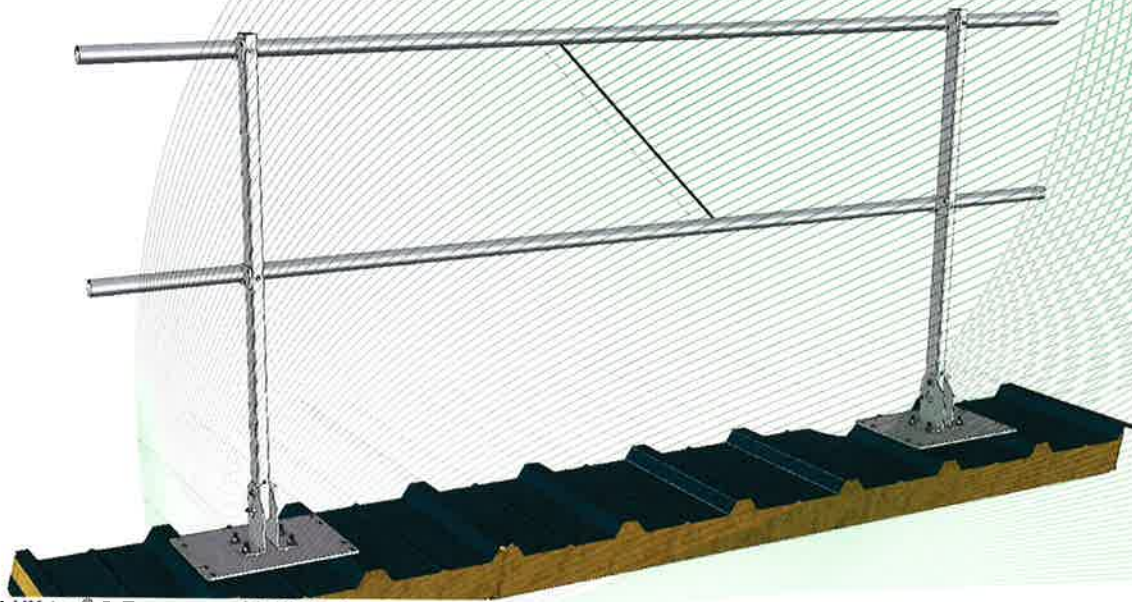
LUX-top® G-T DIREKT with RVT adapter board (assembly example)
